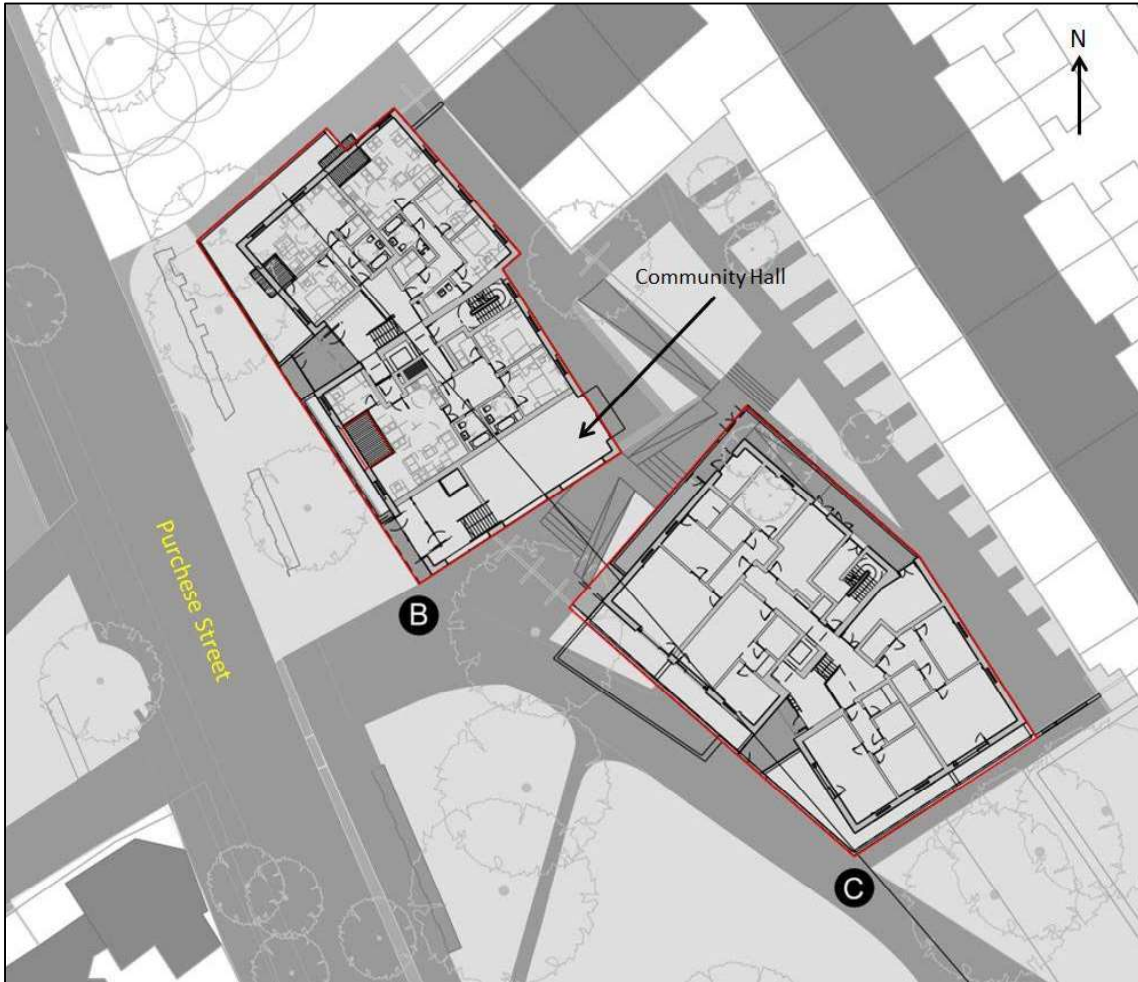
Ground floor plan of proposed Plots 5 and 6 including Community Hall. Drawing correct as at 26/09/2015 – coordination issue.
